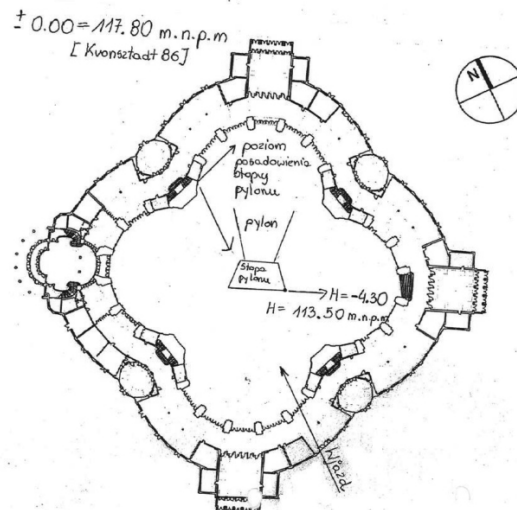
A sketch of the foundation constructed for the movable floor in the performance hall.
